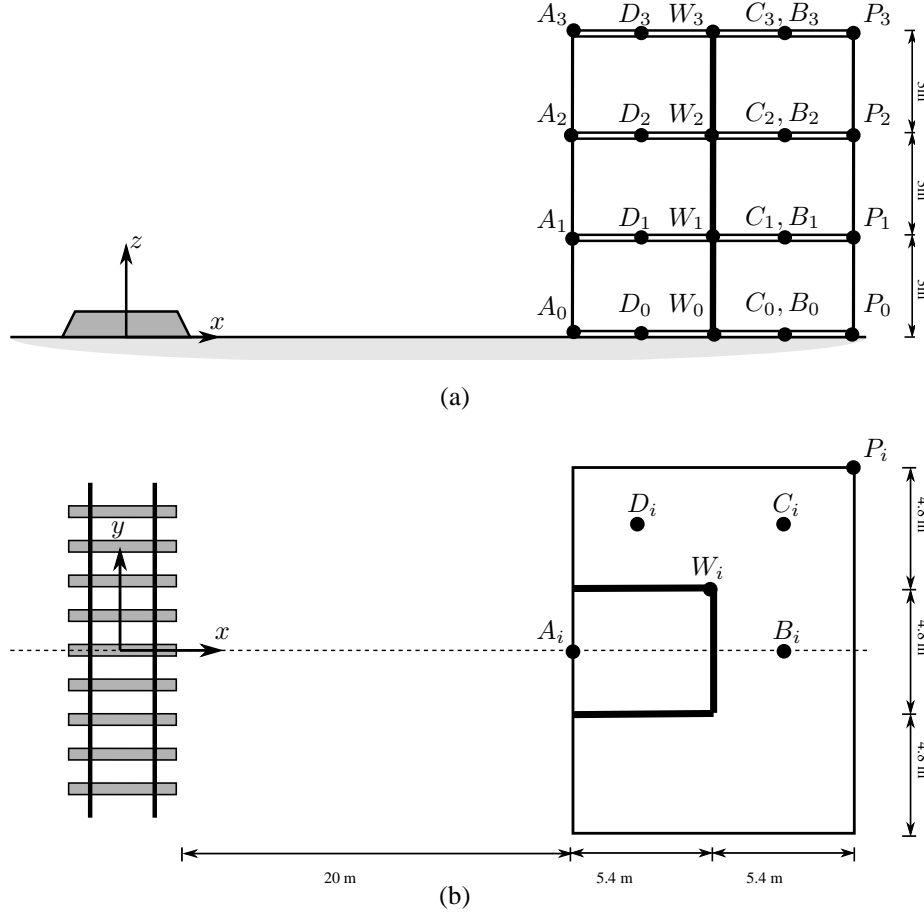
Three story building geometry: (a) frontal and (b) plan view.
